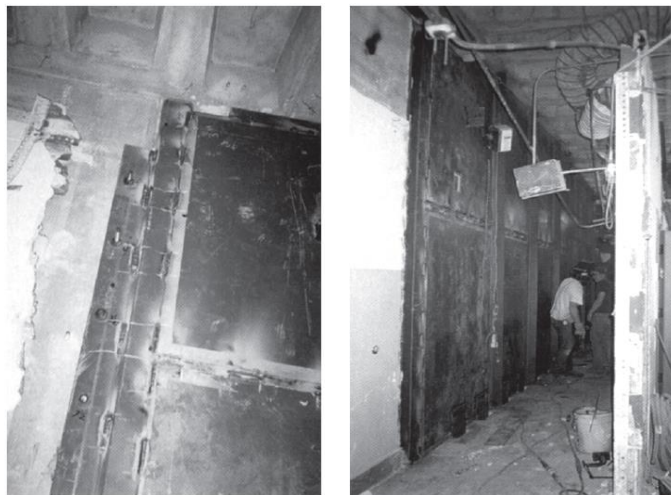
Installation of new steel plate shear walls in the 1937 Oregon State Library (photo courtesy of KPFF Consulting Engineers, Portland, OR)
